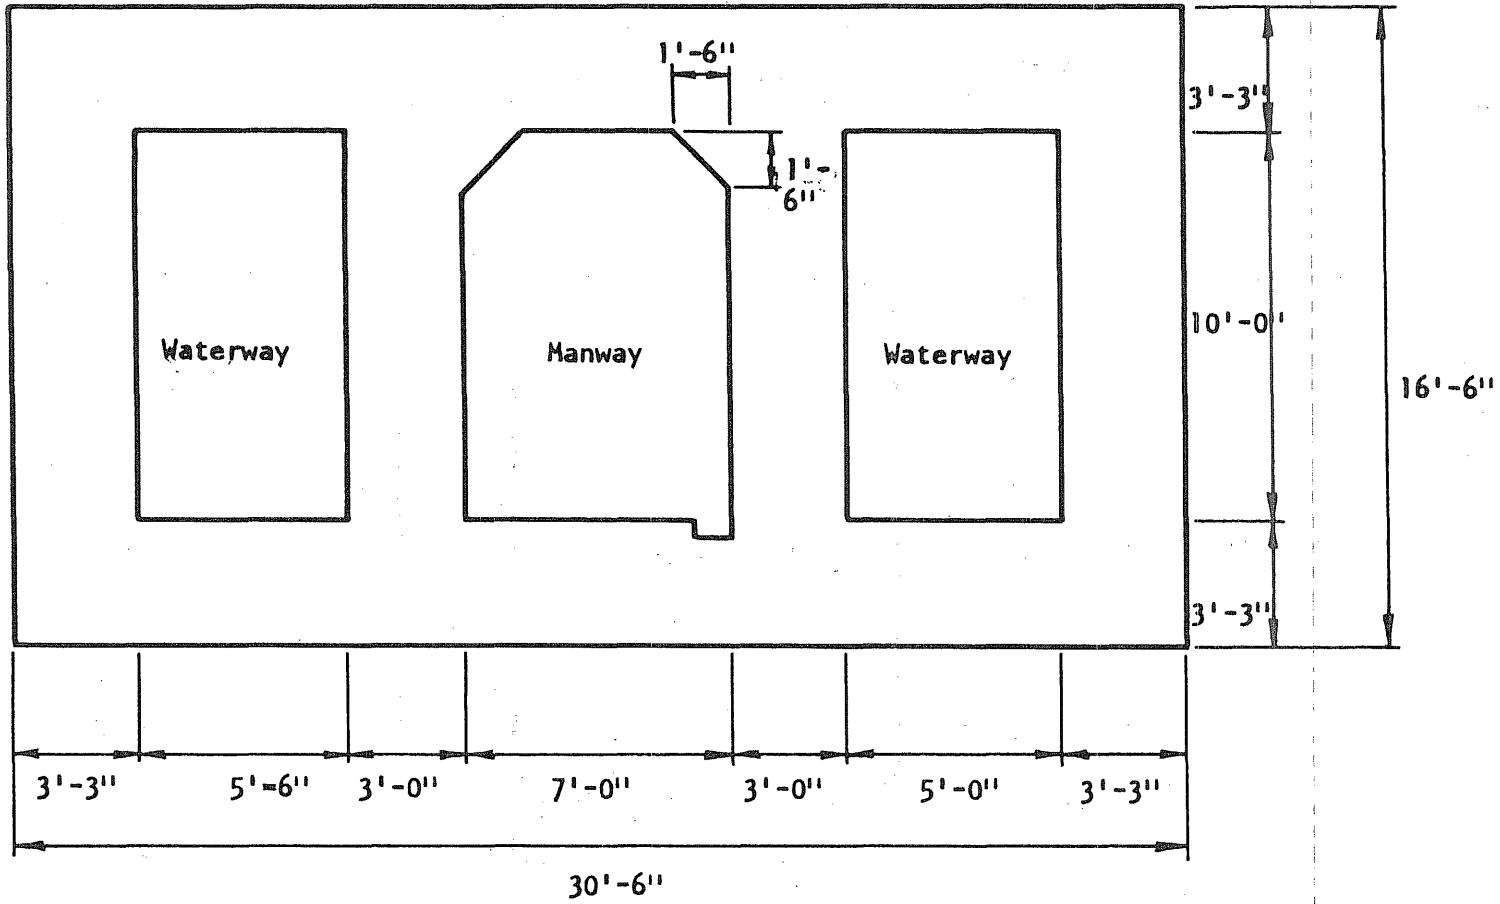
CROSS-SECTION OF CONDUIT THROUGH DAM AT FALL CREEK RESERVOIR, OREGON
